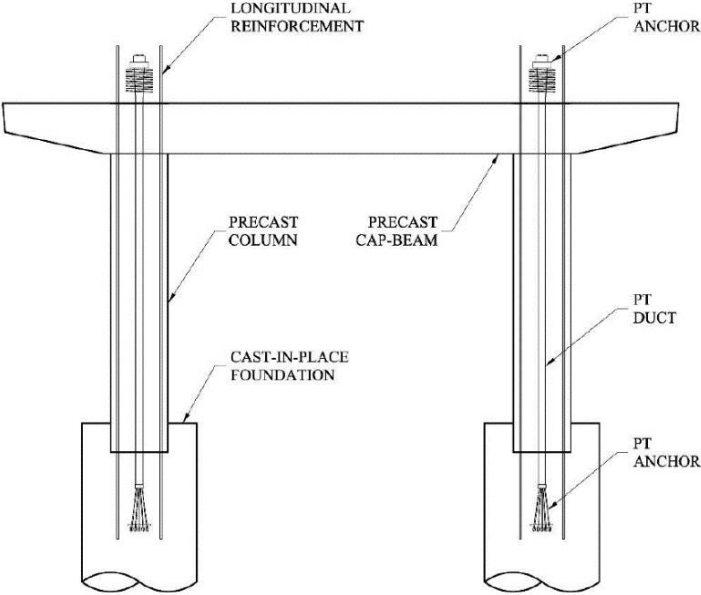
Hybrid precast column system proposed by Hieber et al. (2005)
